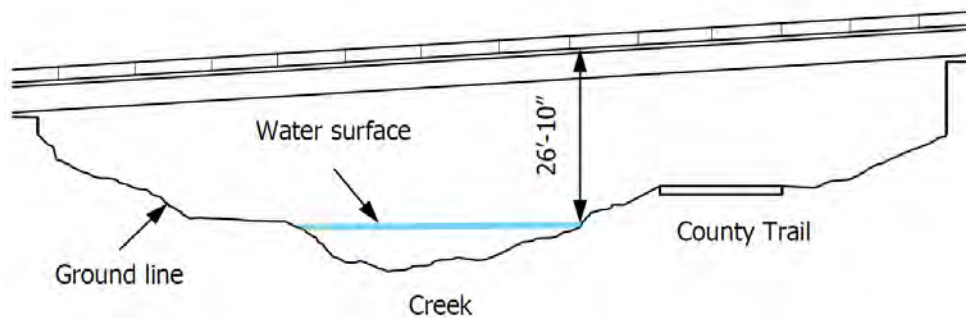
Profile view of a bridge over a creek and trail (Example 1)
